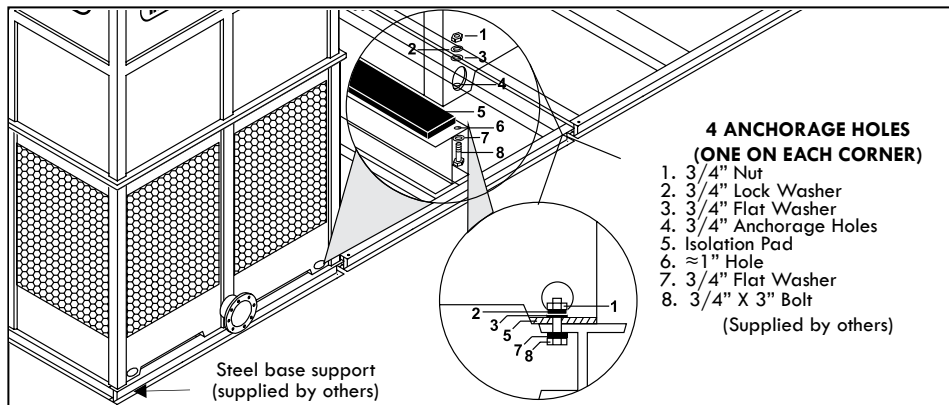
Typical anchorage for a modular tower (RTGMTC)
